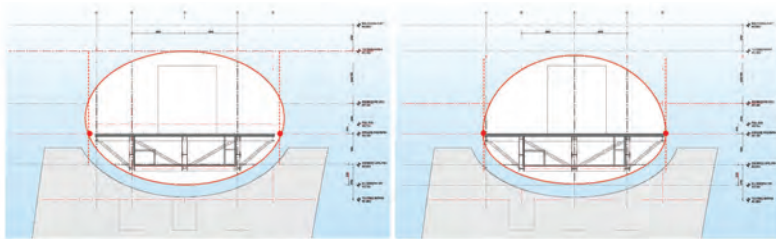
Conservatory section and elevations (Source: Safdie Architects)
